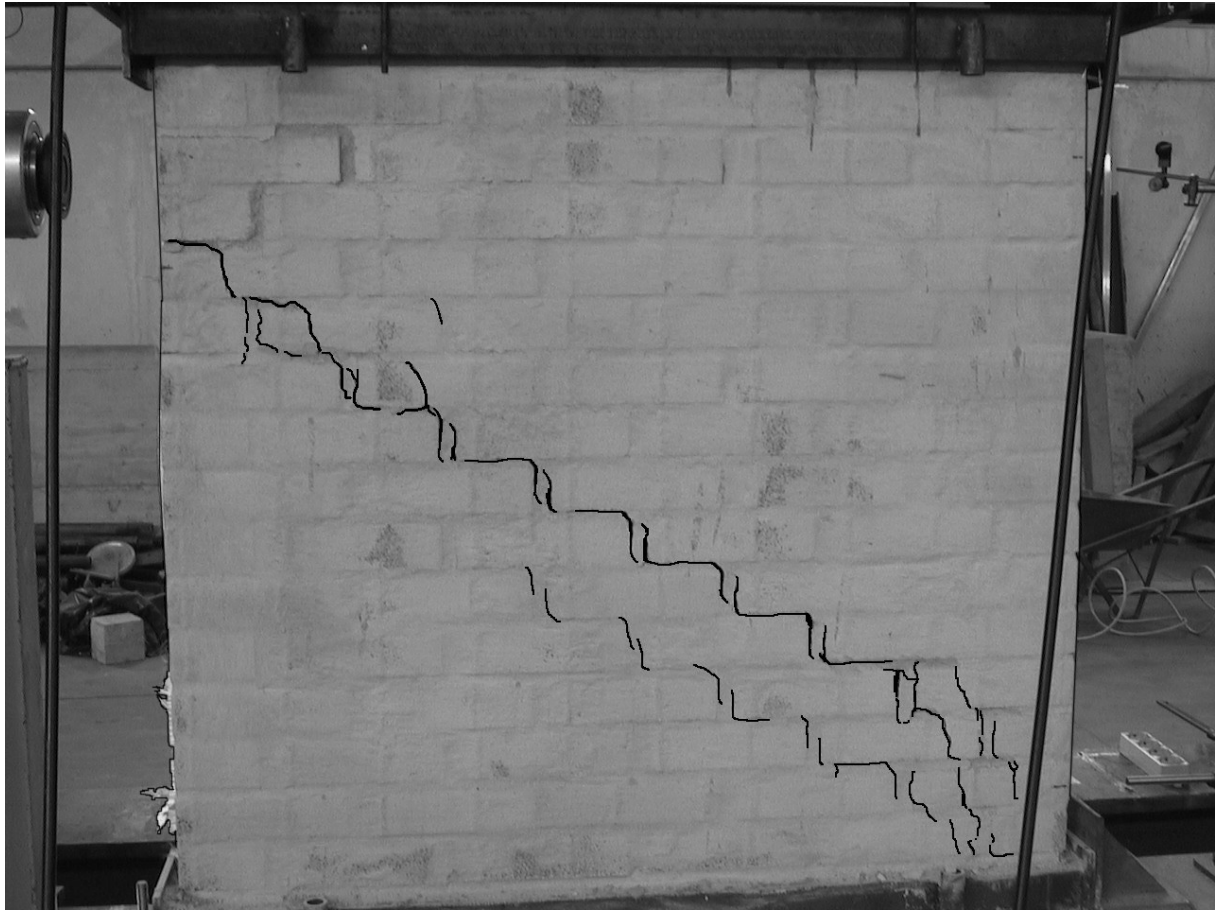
Crack pattern in a strengthened concrete panel (concrete 3).
